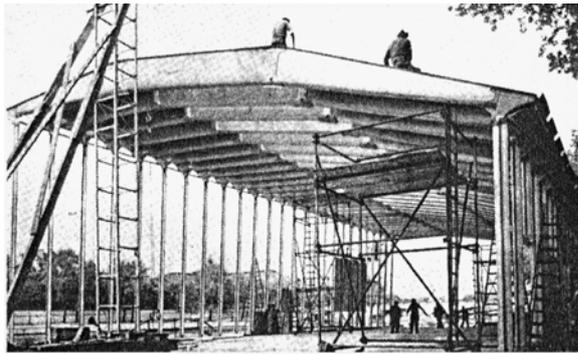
Construction detail of Jean Prouvé's Pavillon de l'Aluminium, 1954.
